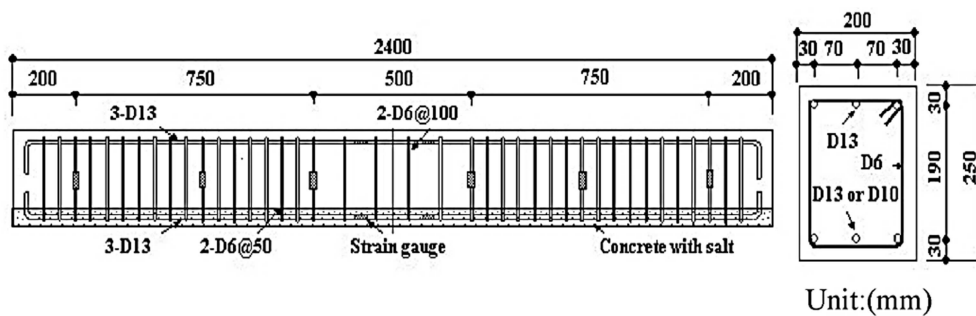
Details of the RC beams tested by Lee et al.[153]
